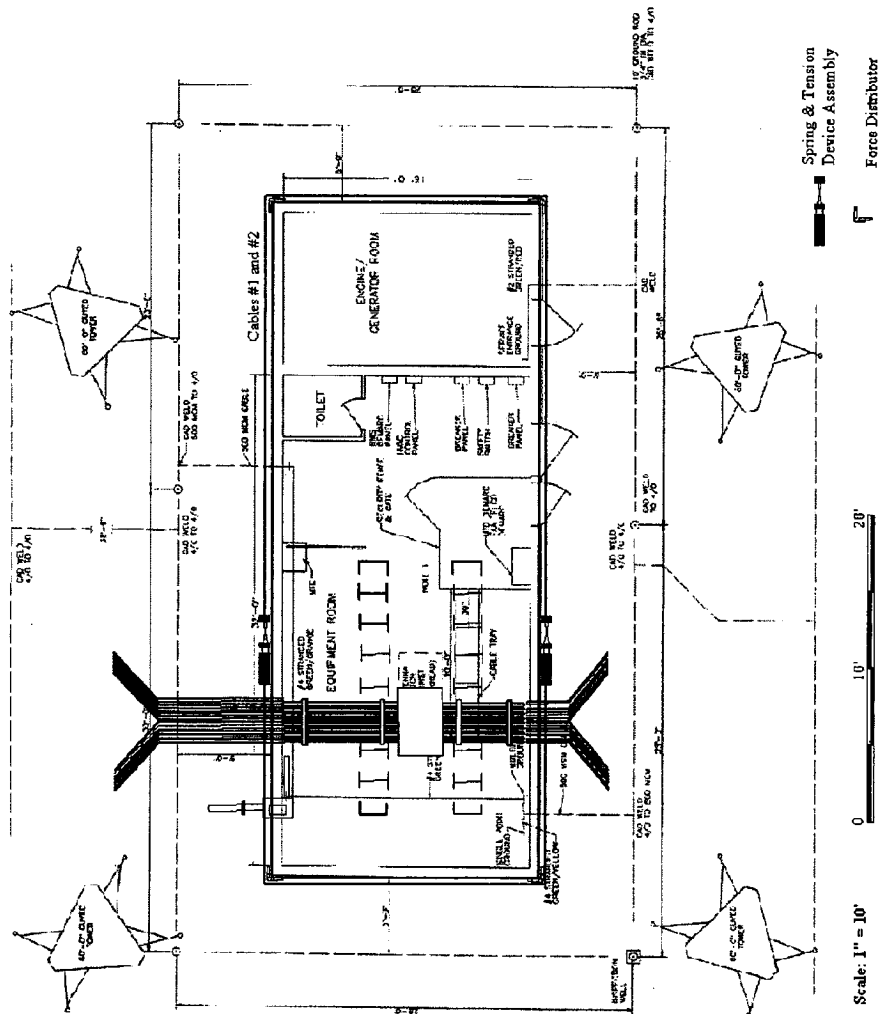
Layout of the Control Building and Recommended Mitigation Measures
